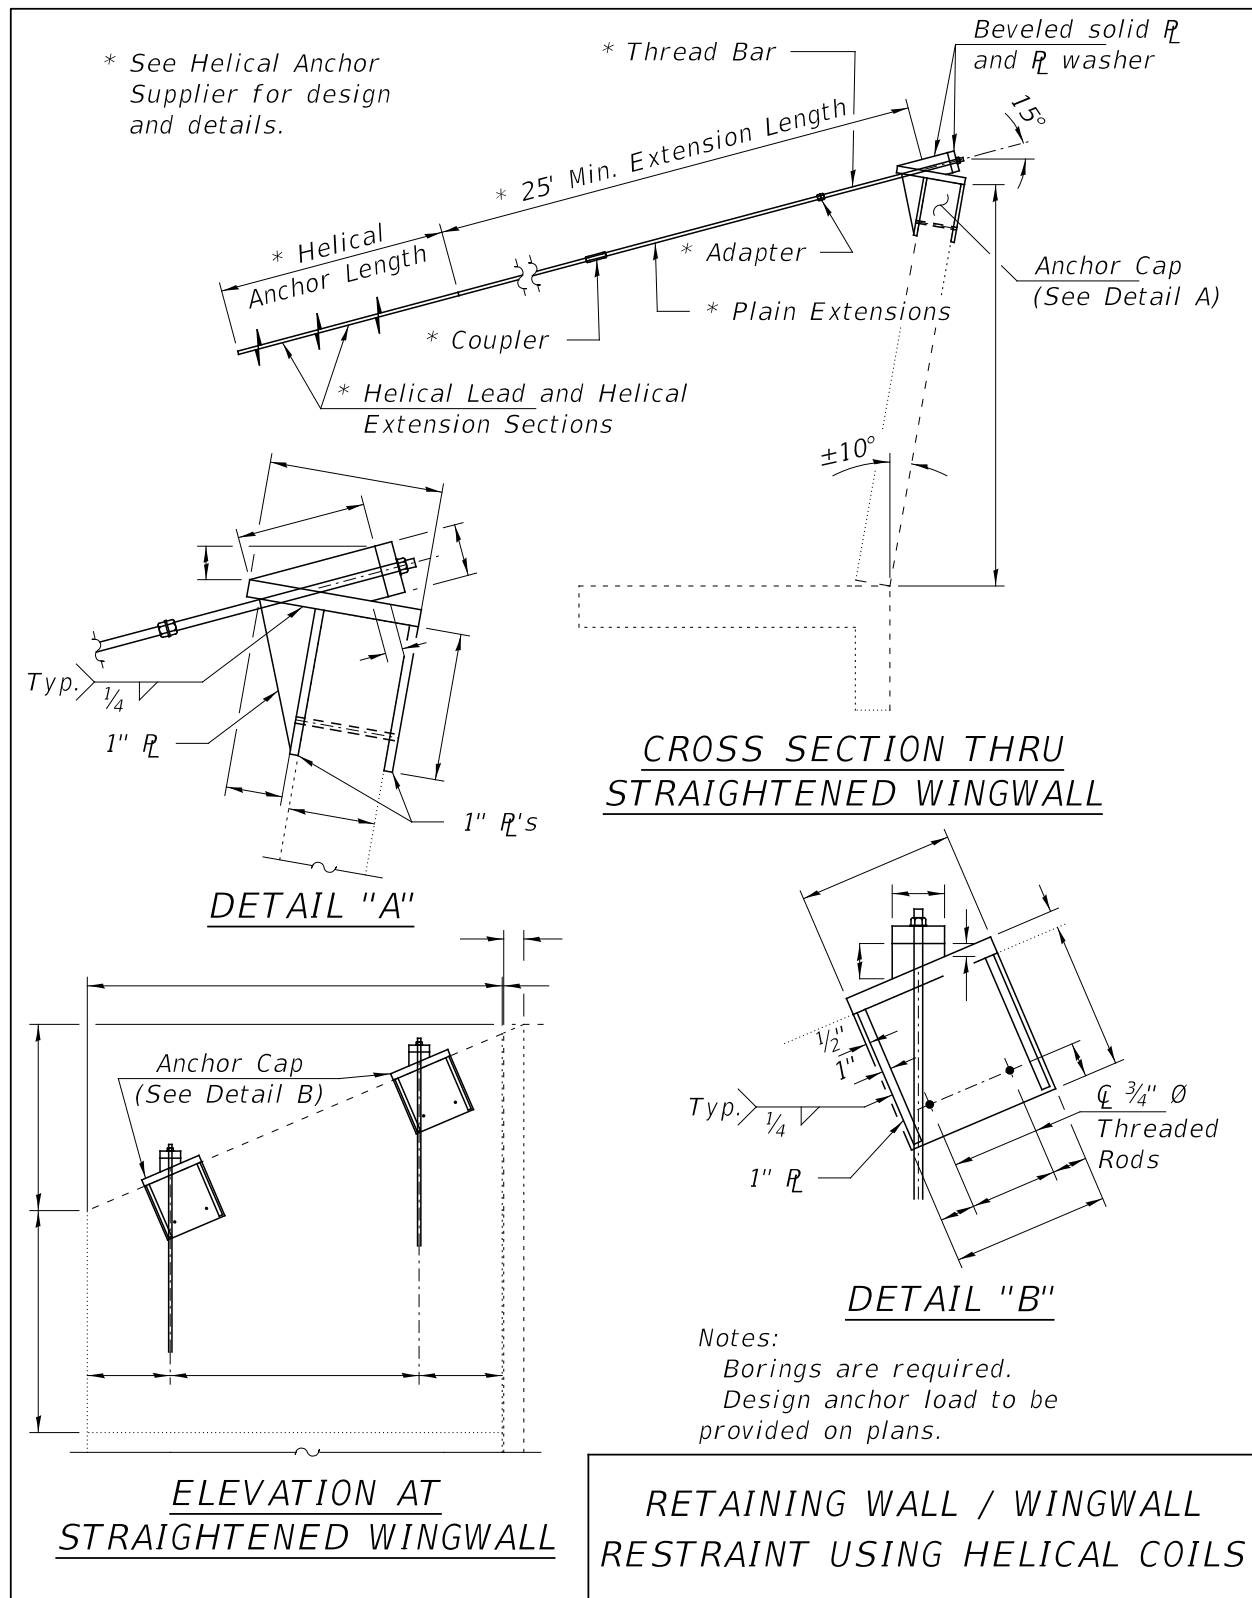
Retaining Wall / Wingwall Restraint Using Helical Coils
